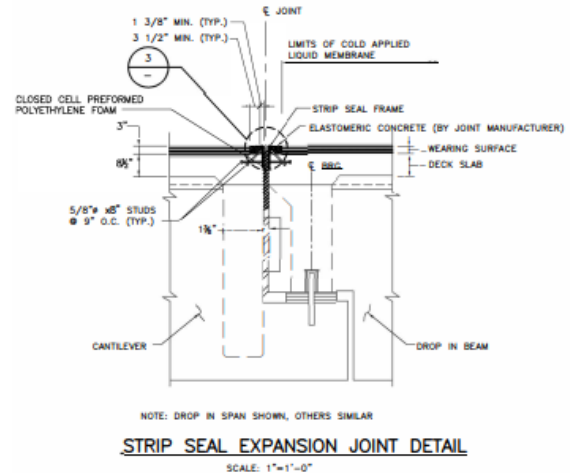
Strip Seal Joint Detail, Sheet 48, RIDOT Contract 2016-CB-059, 2016.
